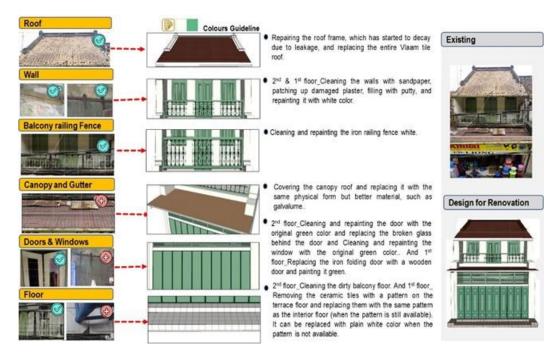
Proposed Renovation for Liong Shop House Source: Author, 2023
